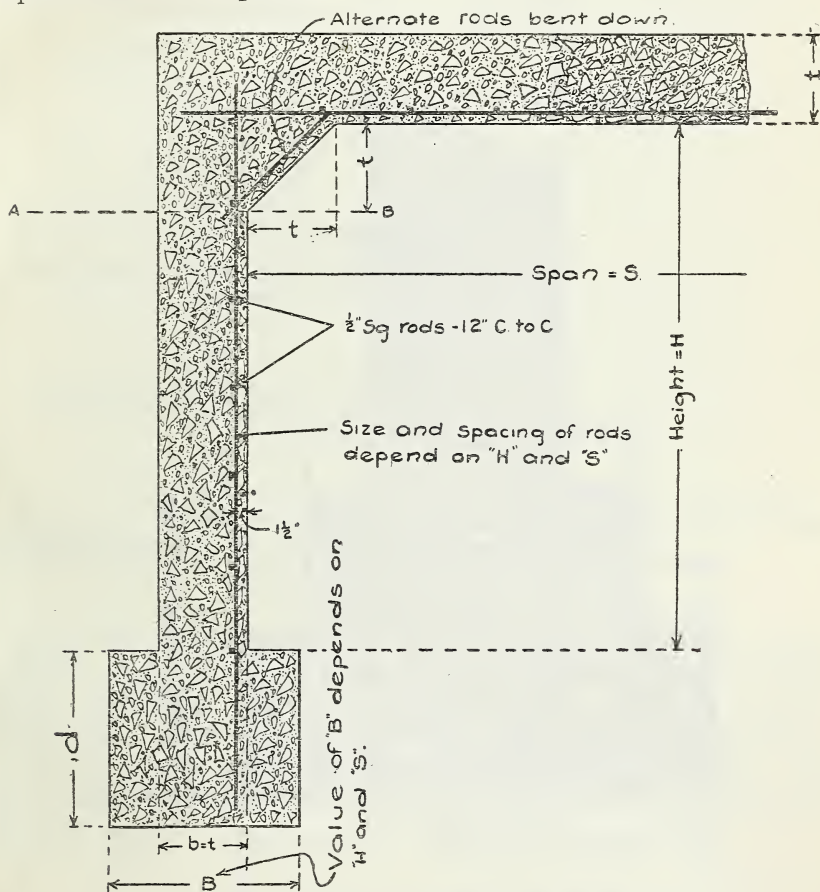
Typical section for a reinforced-concrete abutment wall.
